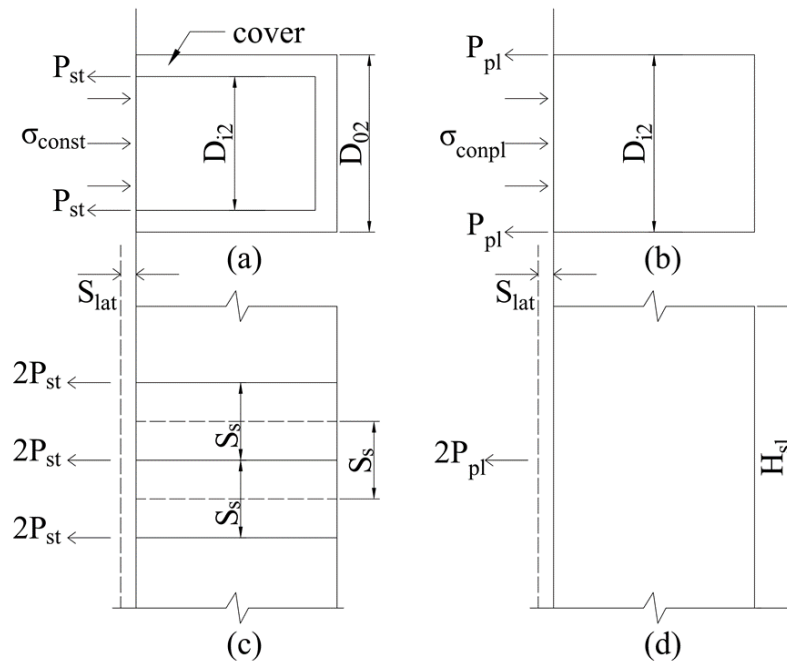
(a) and (c) stirrup confined concrete and (b) and (d) plated concrete members
